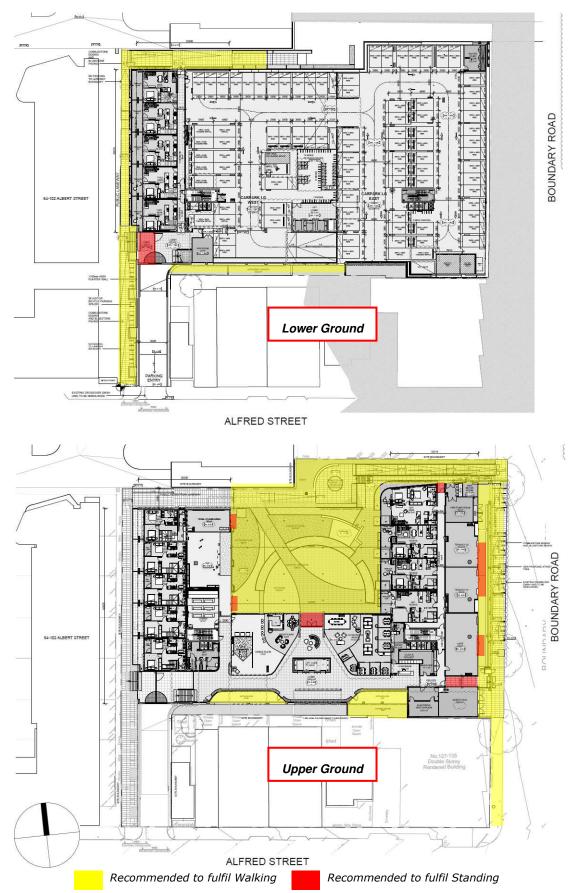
Lower Ground (top) and Upper Ground (bottom) floor plan with recommended wind criteria overlaid.
